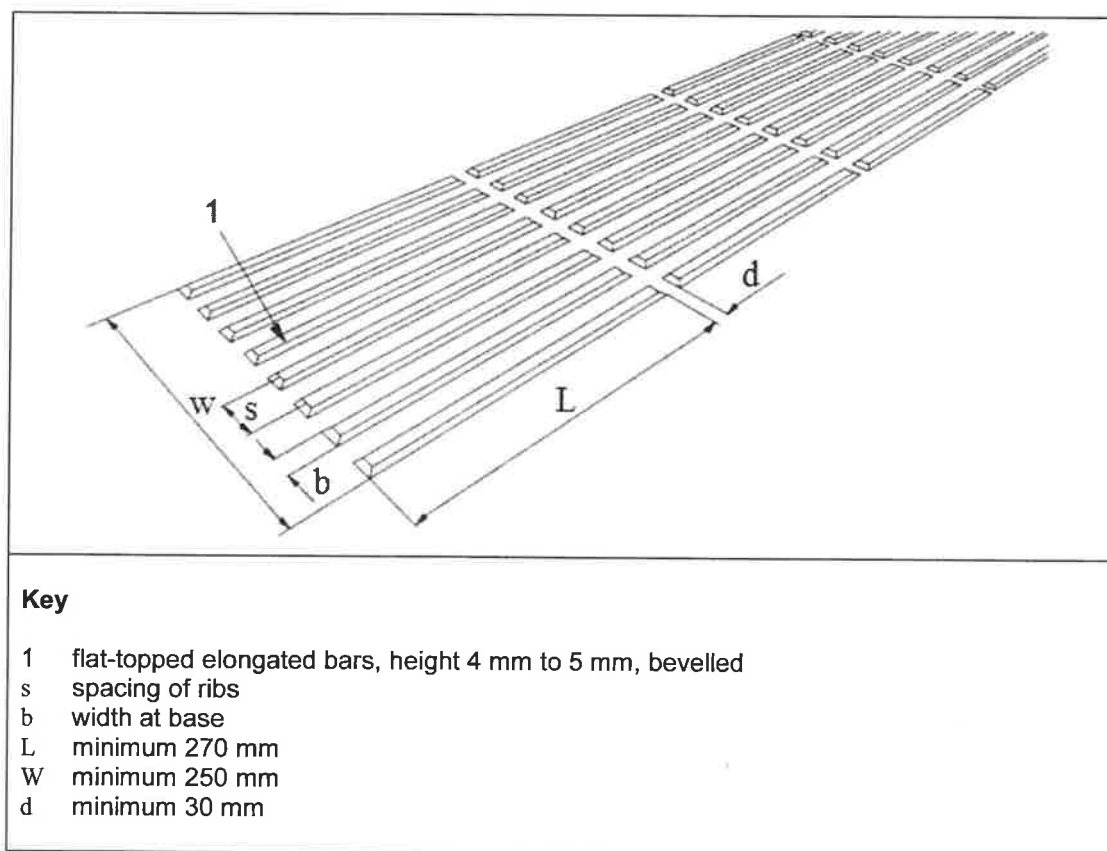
Spacing and dimensions of flat-topped elongated bars
